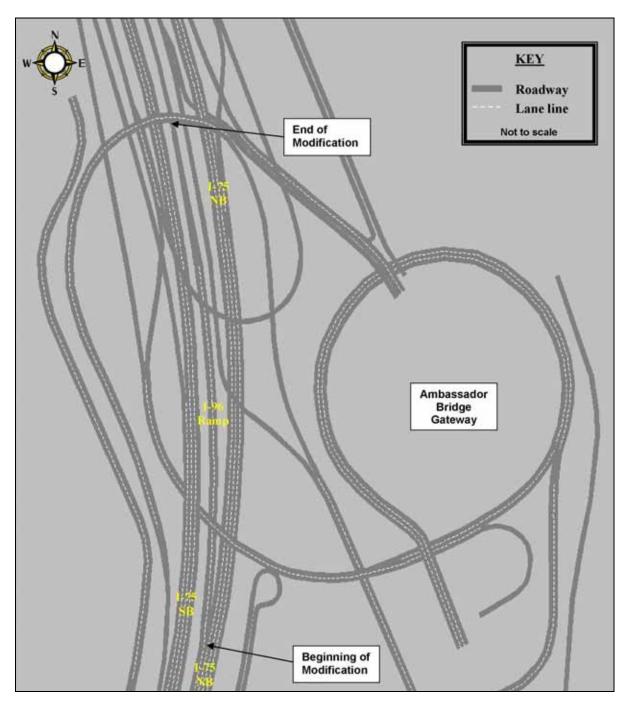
NB I-75 to WB I-96 Proposed Two-lane Ramp Detroit River International Crossing Study
